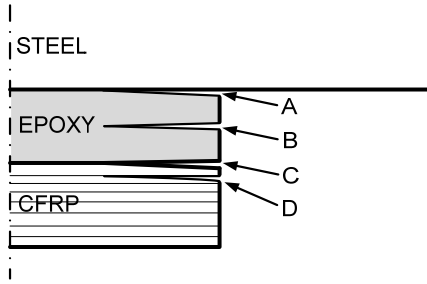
Different failure modes in steel beams strengthened with adhesively bonded CFRP-laminates; A) Interfacial failure between steel and adhesive, B) Cohesive failure, C) Interfacial failure between Adhesive and CFRP and D) Delamination of CFRP laminate.
